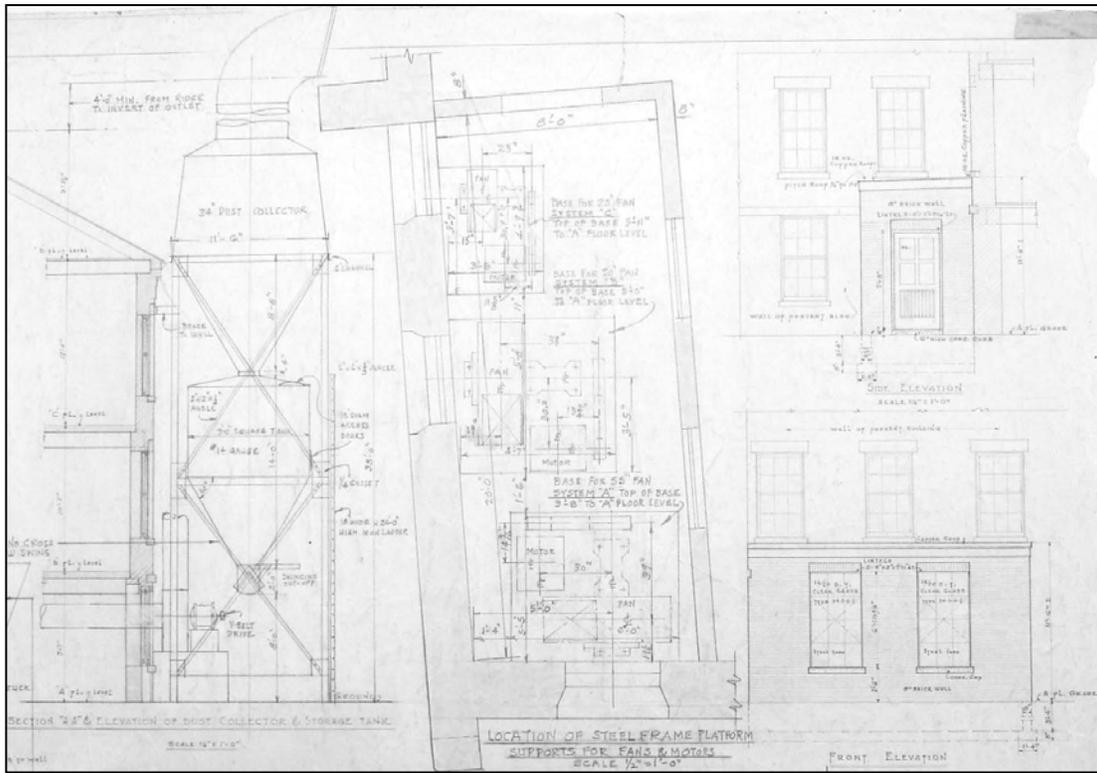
Dust Collecting System Carpenter Shop Spaces 27-A-7 and B-51, Hill Shops, Springfield Armory U.S.A., July 9, 1940; plan detail, not to scale.
